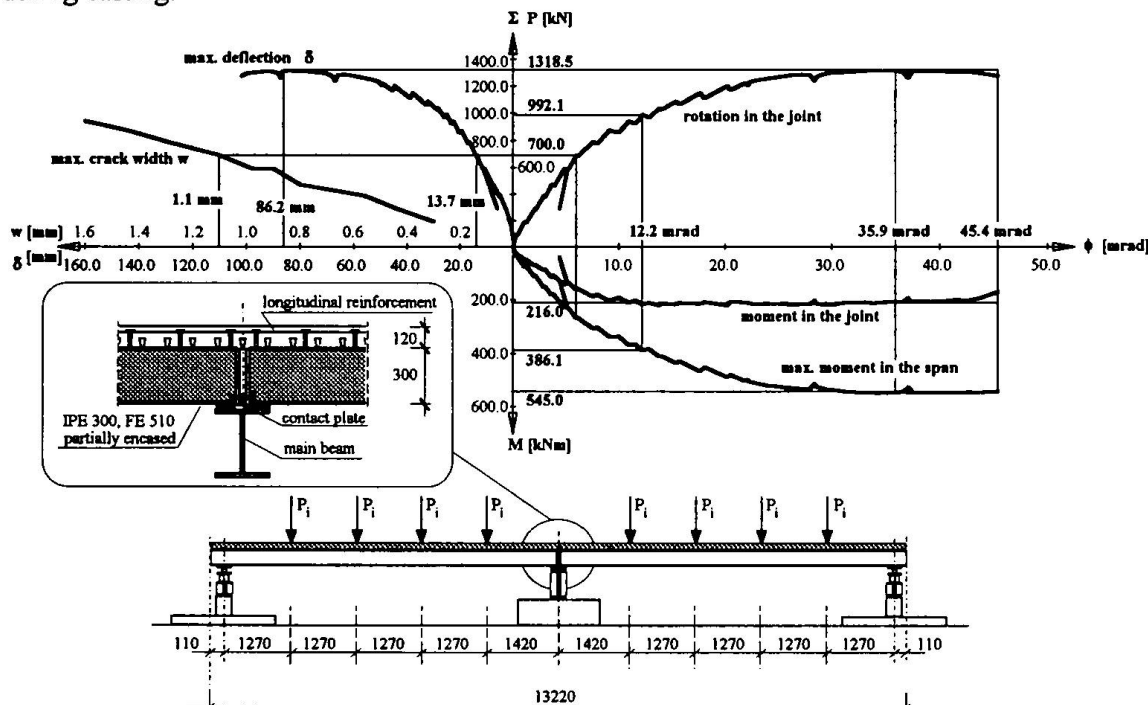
Results from a test with a semi-continuous floor beam [5]
